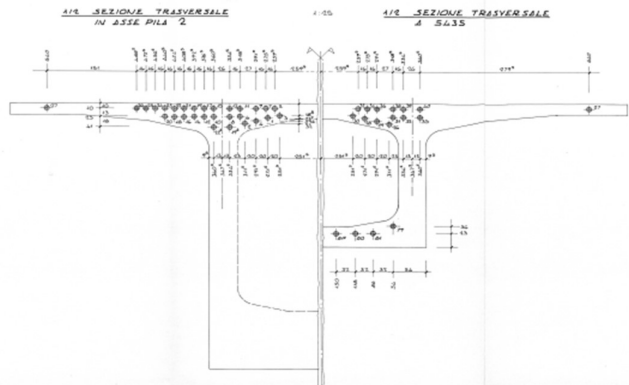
Cross-sectional view and arrangement of tendons between pier 2 and pier 3.
